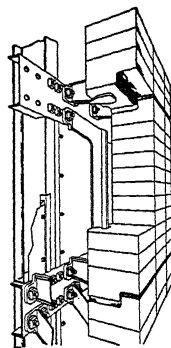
Supported wall in which tile fit on cast-iron hangers bolted to the supporting panel work.
